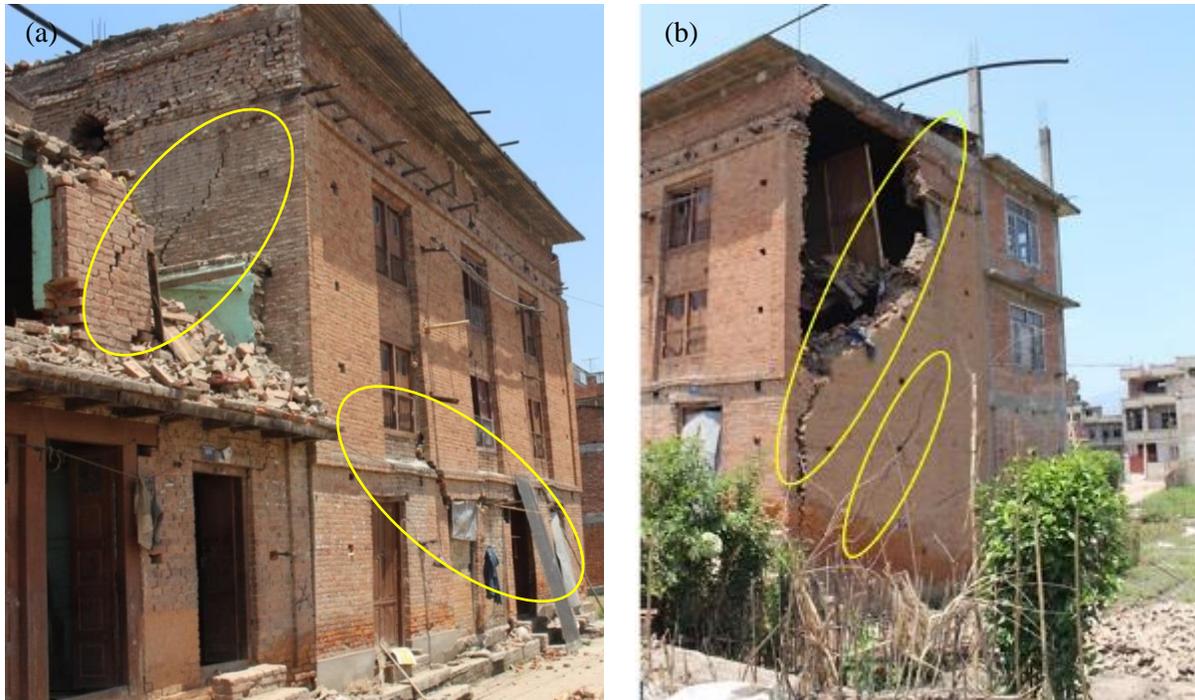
Diagonal cracking on the walls of a building due to lack of lintel and floor bands.
